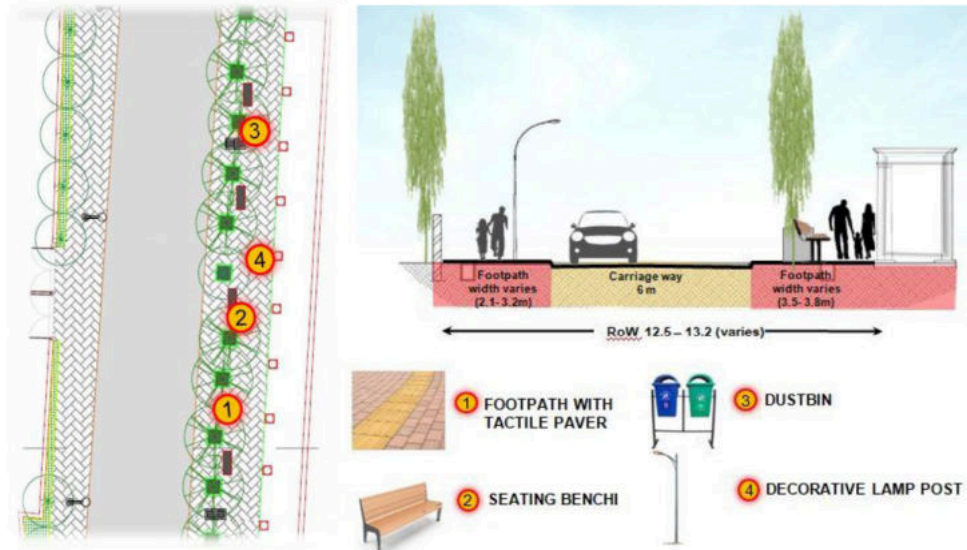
PLAN, SECTION AND ELEMENTS PROPOSED ON THE RETROFITTED ROAD
